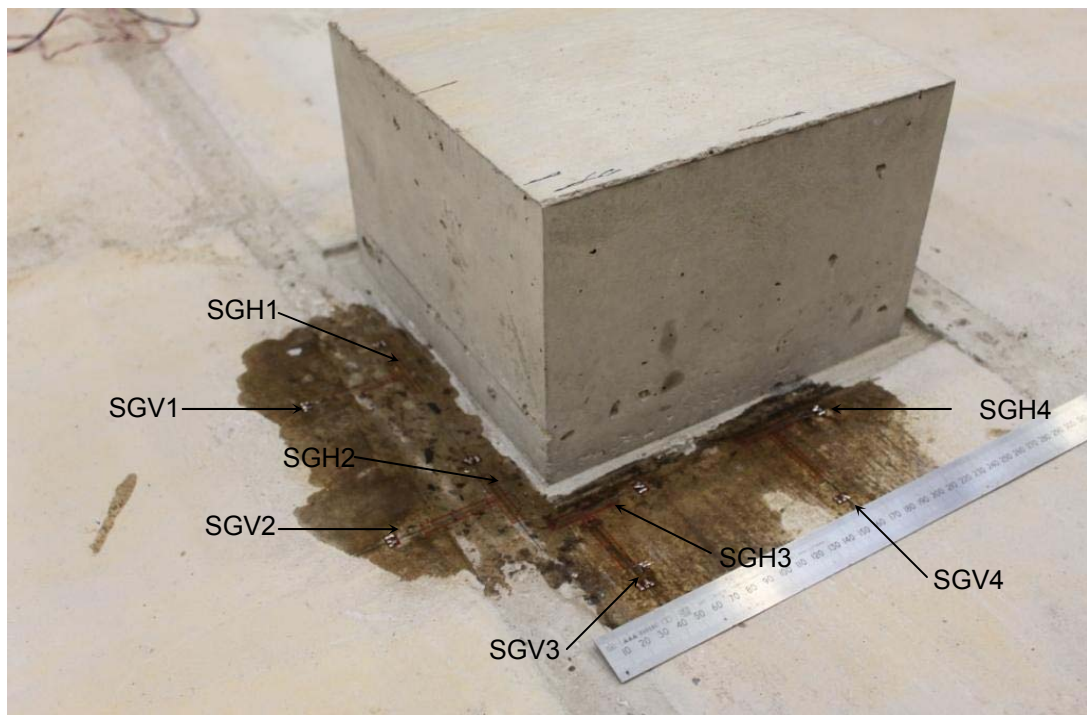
Concrete strain gauges glued to concrete surface around column.
